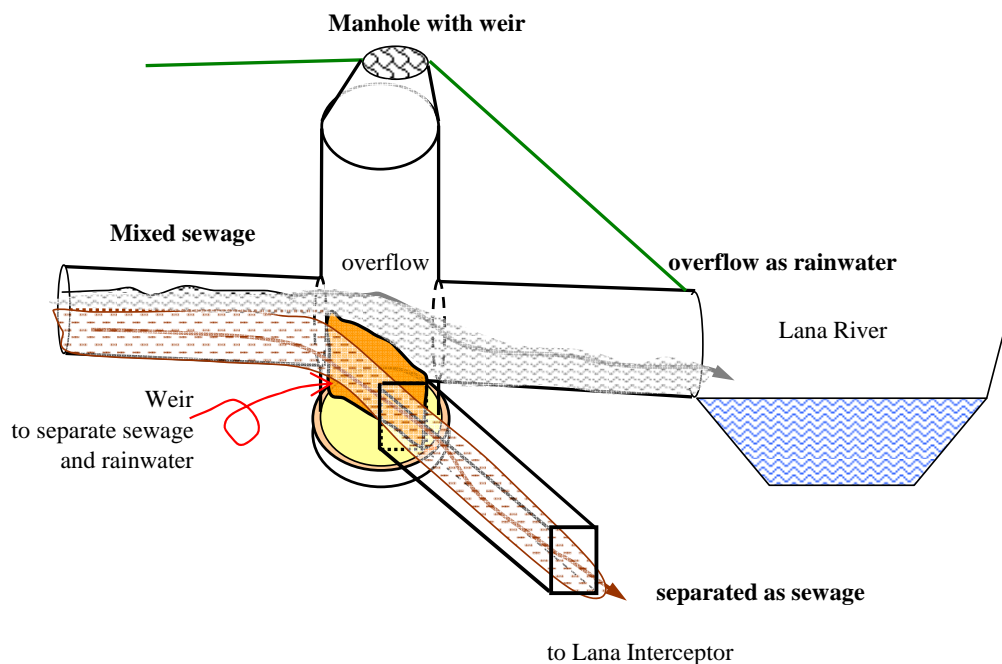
Manhole and Weir arrangement Used to Separate Mixed Sewage and Rainwater during Wet Weather Conditions
